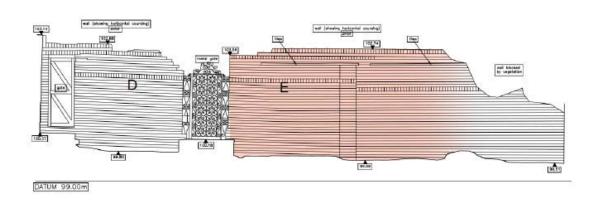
South end of the boundary wall as viewed from No. 22 Frognal Way. (Structurally unstable sections of the wall highlighted in red)
